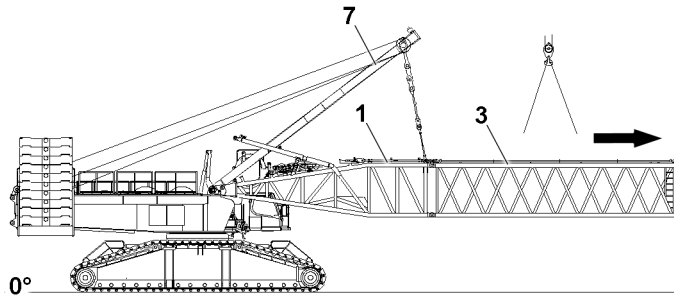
Disassembling the D-intermediate section on the D-pivot section
